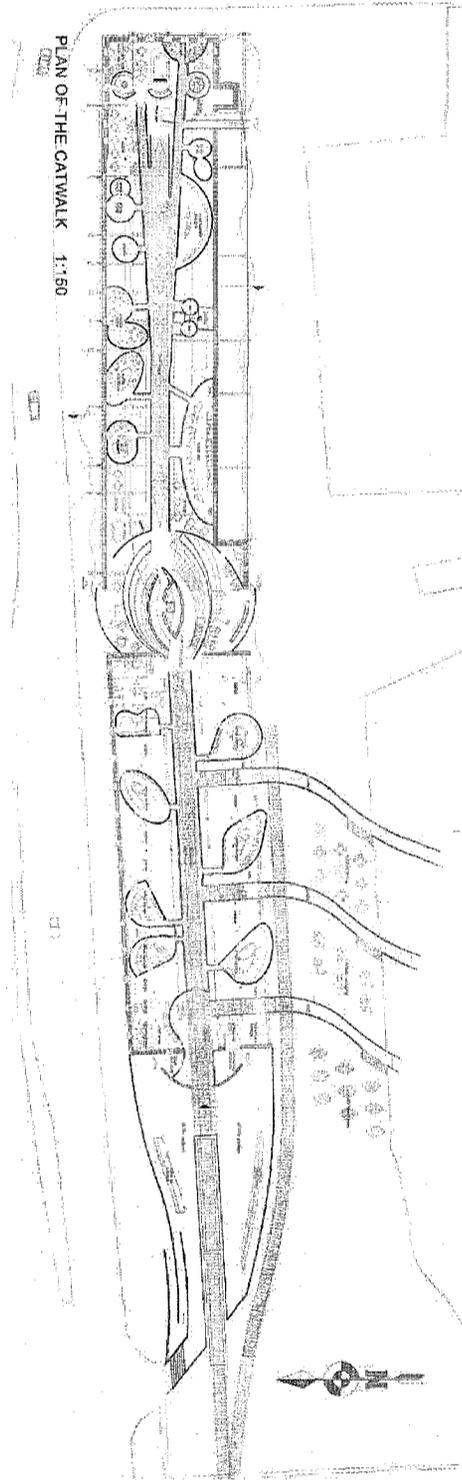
Plan of catwalk passing through buildings 1 (top) to 6 (bottom)
